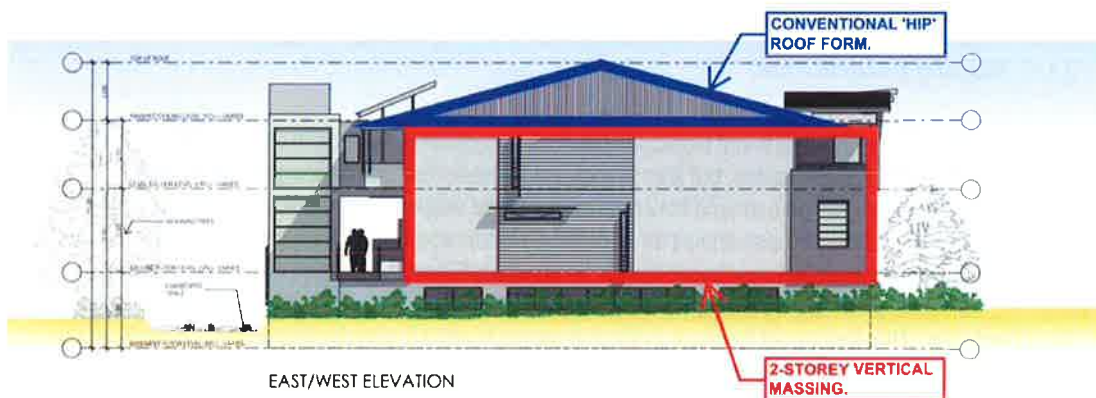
Typical Apartment Block Side (East/West) Elevation Massing & Overall Form
